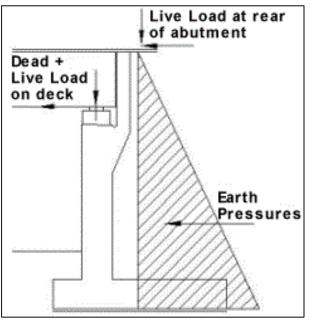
Typical Cantilevered Abutment (Childs, 2009)
